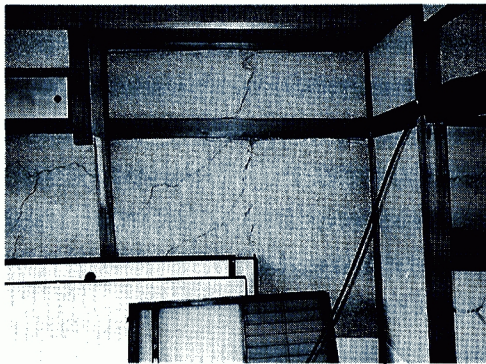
Wall deformation and crack (second floor in the House SI).
